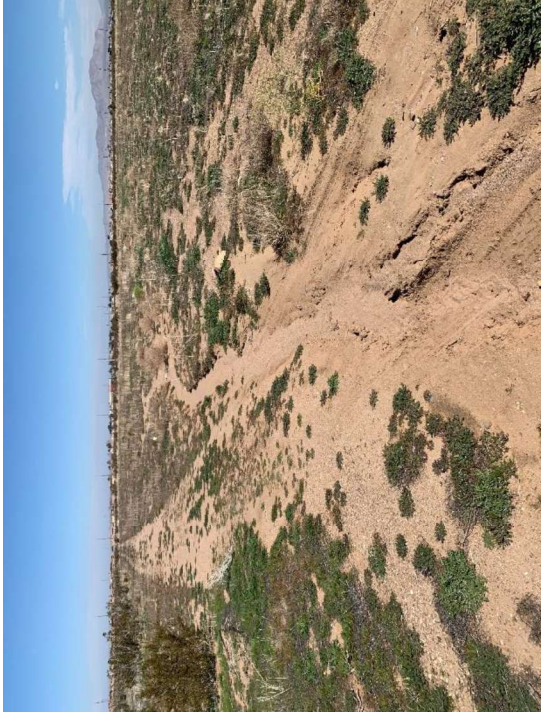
Downstream view of drainage 1 near the western edge of the project site.
